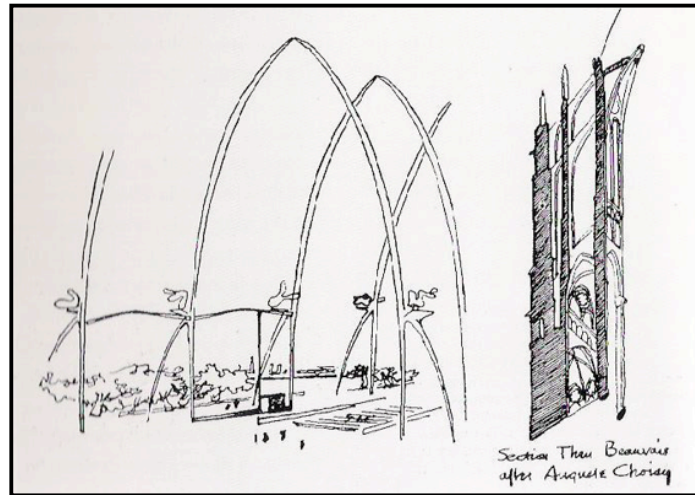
Louis Kahn “A Cultural Center” and tracing of Auguste Choisy’s axonometric section of Beauvais Cathedral, 1944. (Goldhagen, 2001, p.32)
